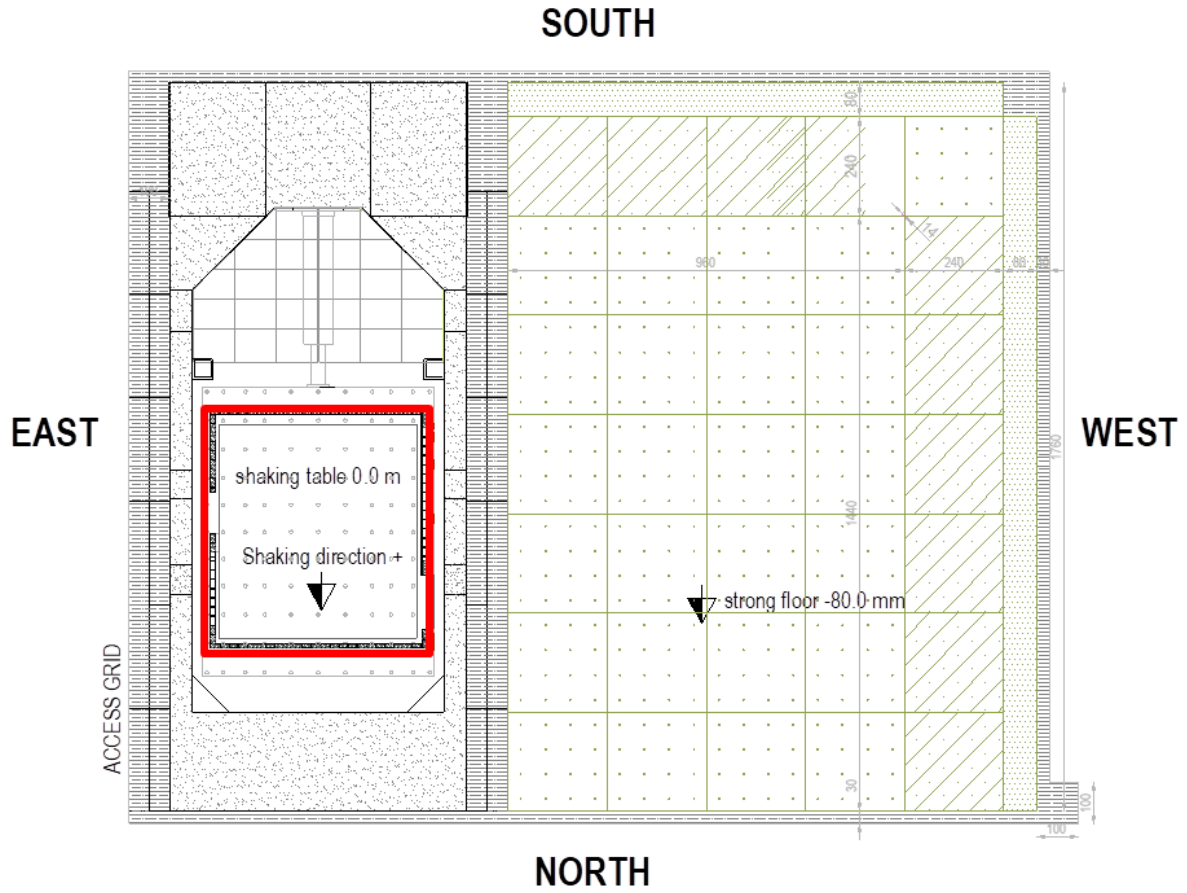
Plan view of the EUCENTRE Lab. and position of the shake-table and the walls of the test-house.
